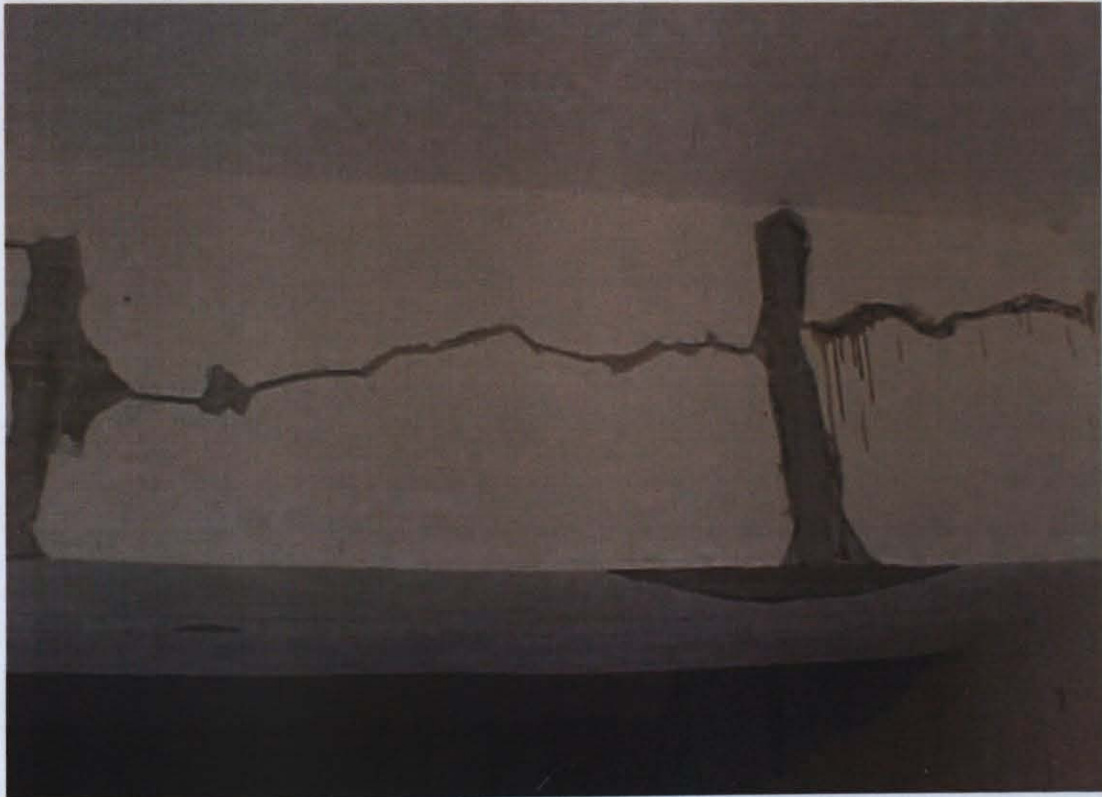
Bending failure of beam at Büyükçekmece Gürpınar İ.Ö.O.
